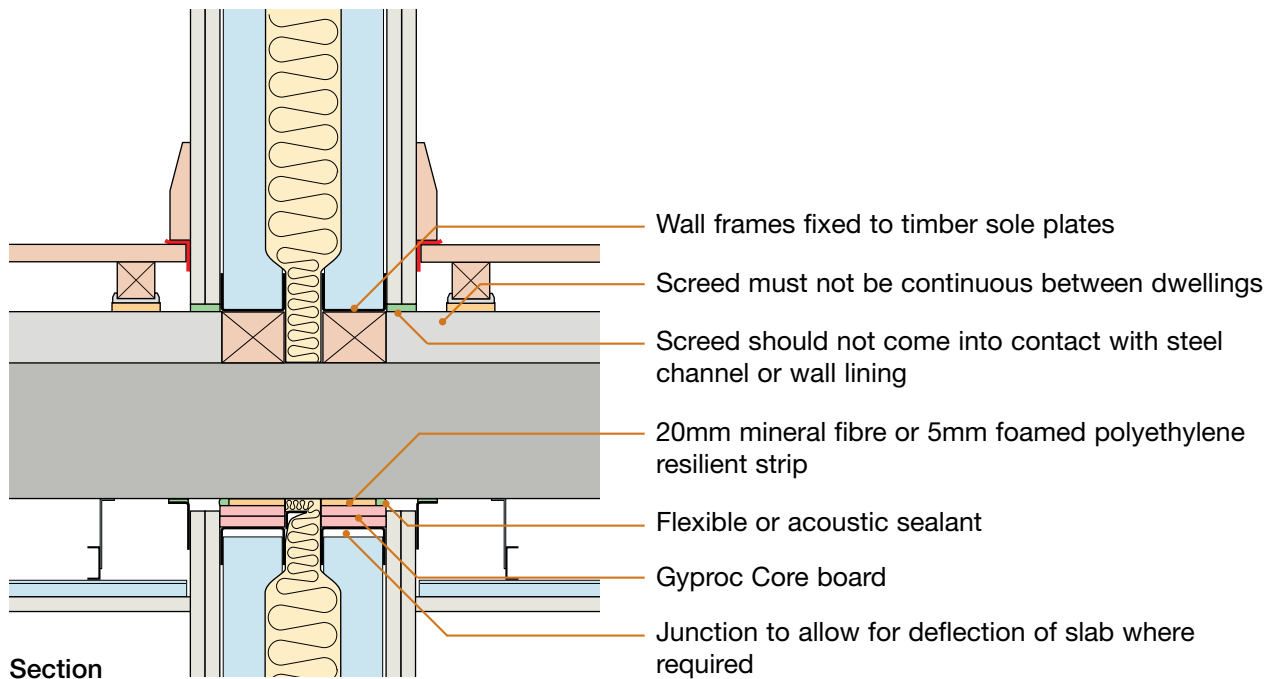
type floating floor treatment and metal ceiling treatment
